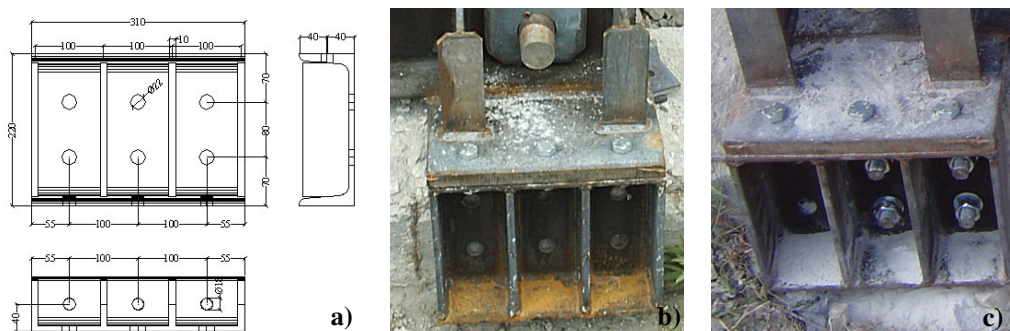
Steel frame – RC beam connection: a) carpentry; b) the system realization; c) the use of threaded bars
